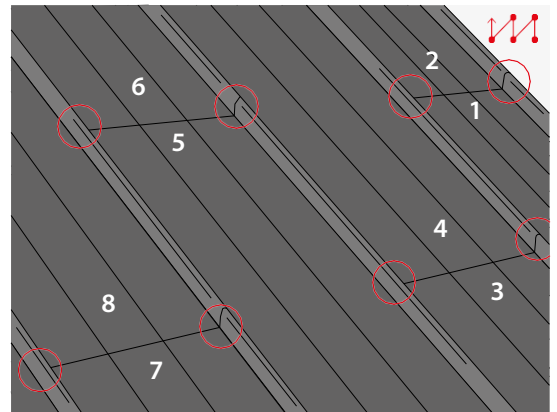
LAYOUT OF PANEL JOINTS ON THE ROOF
